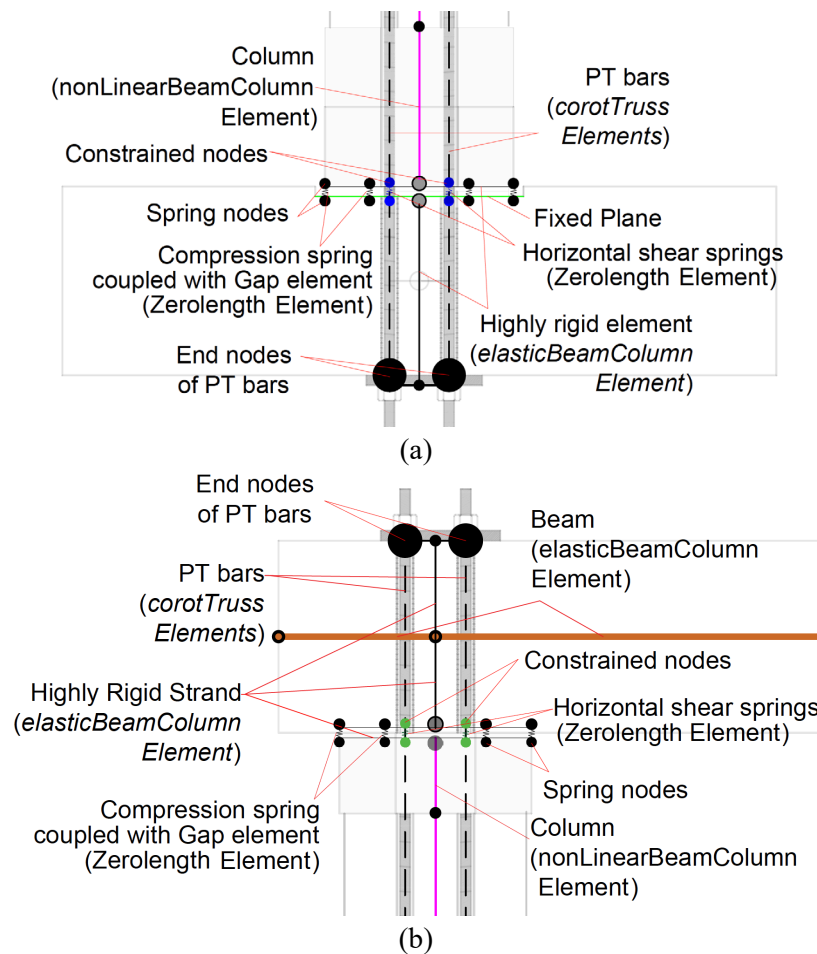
Schematic layout of arrangement of elements: (a) bottom joint; (b) top joint
